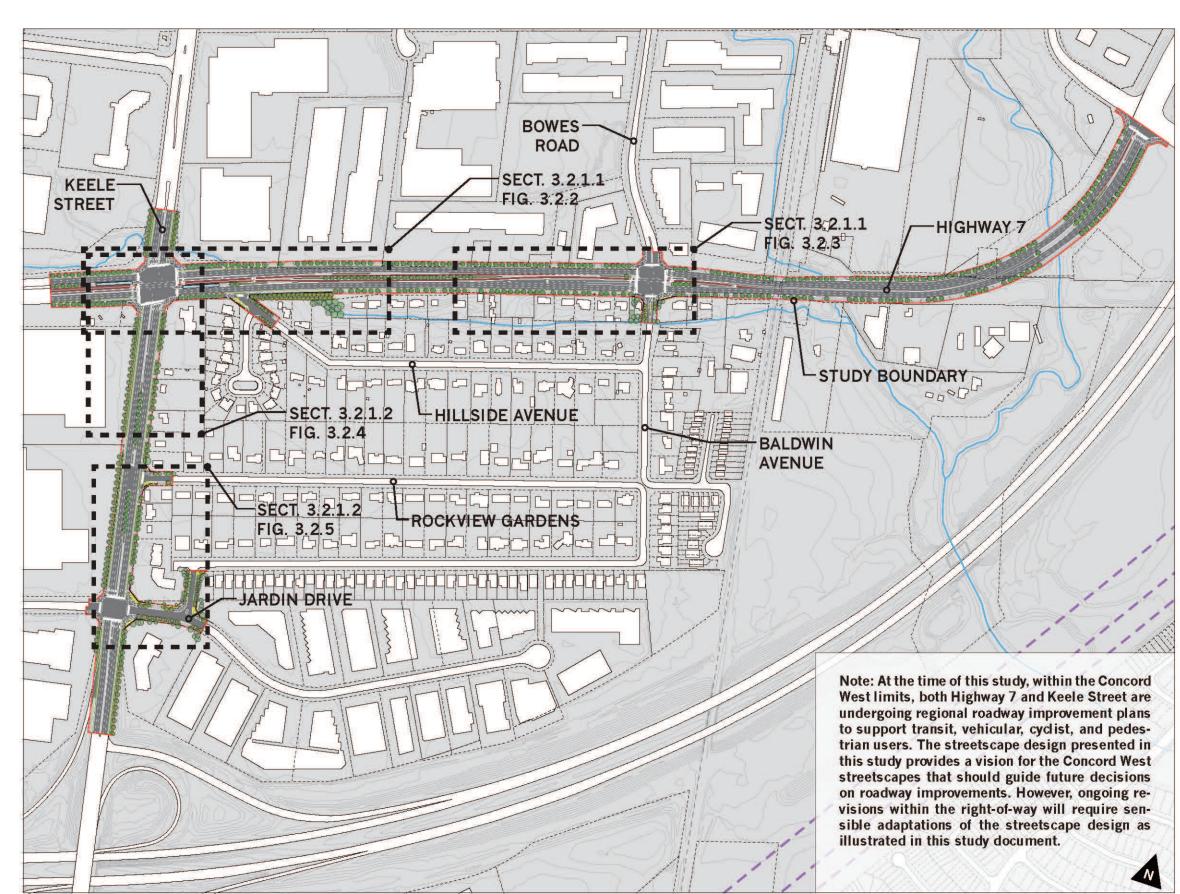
Concord West Streetscape Master Plan study area.
